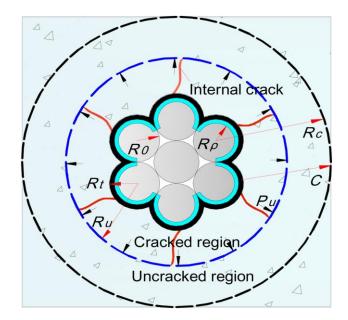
Concrete Cracking due to Strand Corrosion (Dai et. al 2020)
